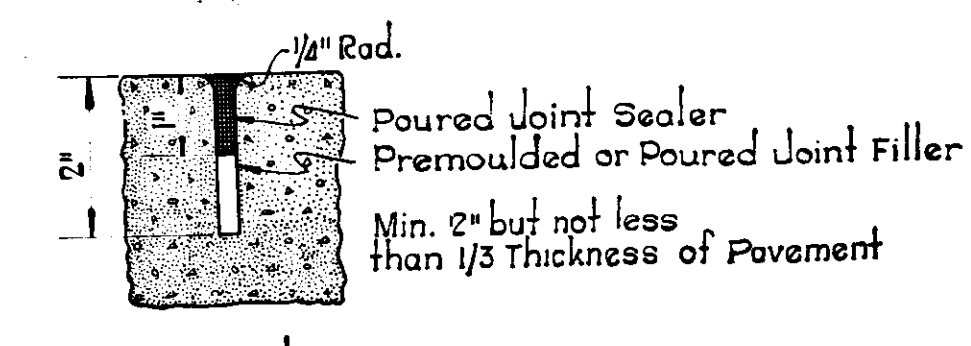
DETAIL OF SPECIAL SEAL FOR ALL EXPANSION JOINTS FOR CONC. PAVEMENT
